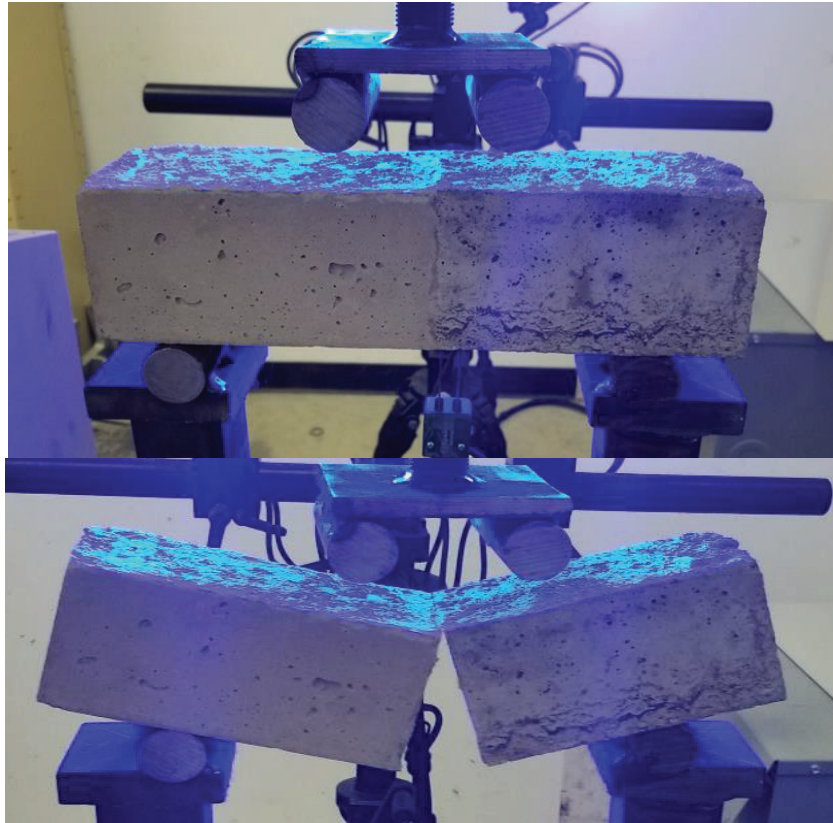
CTS Concrete in Vertical Adhesion Before (Top) and After (Bottom) Loading
